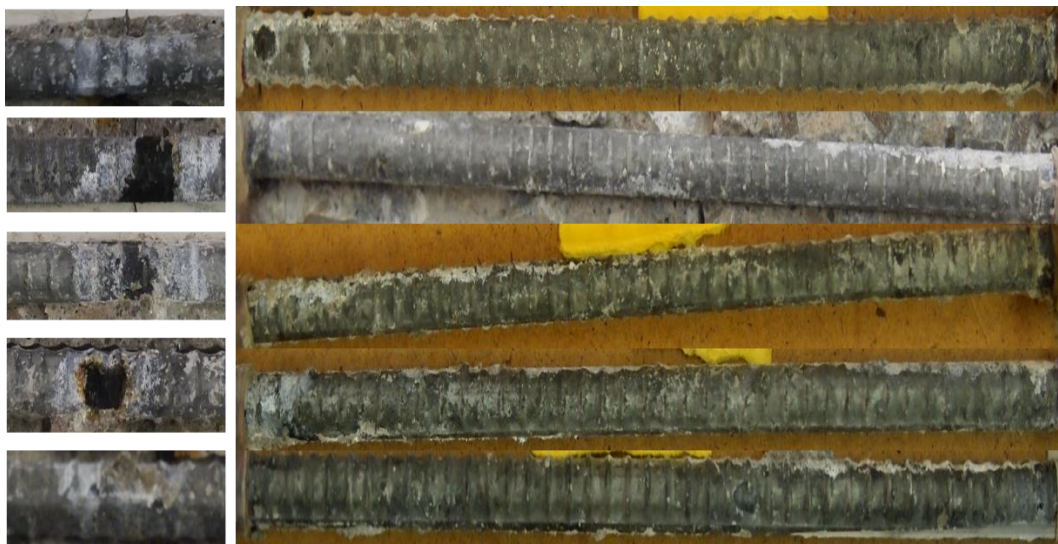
Non-exposed surface (to concrete crack) of bars in transversely- (left) and longitudinally- (right) cracked HDG steel specimen 1 to 5.
